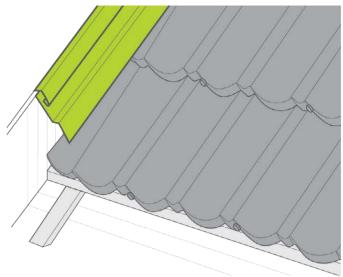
INSTALLING WALL FLASHINGS (ALTERNATIVE)
